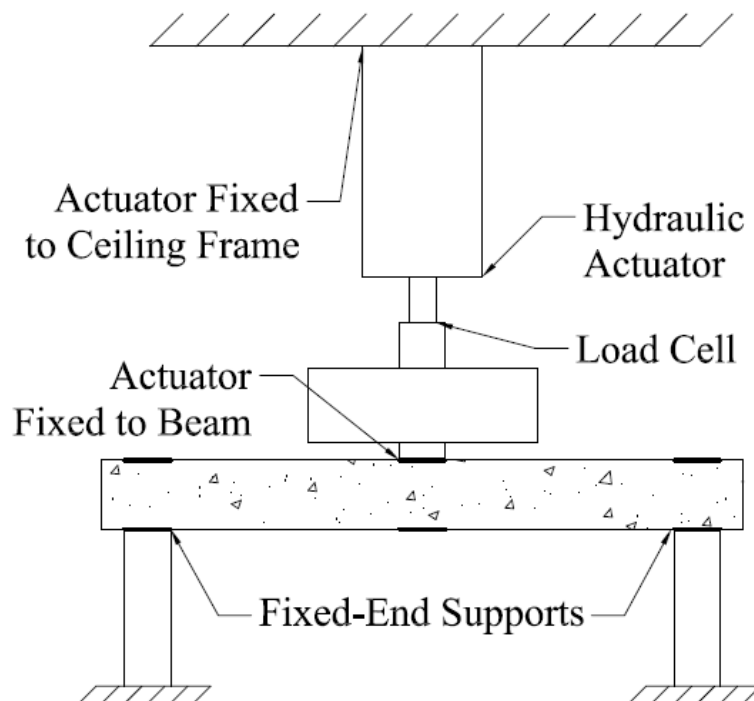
Schematic Diagram of Loading Frame and Specimen
